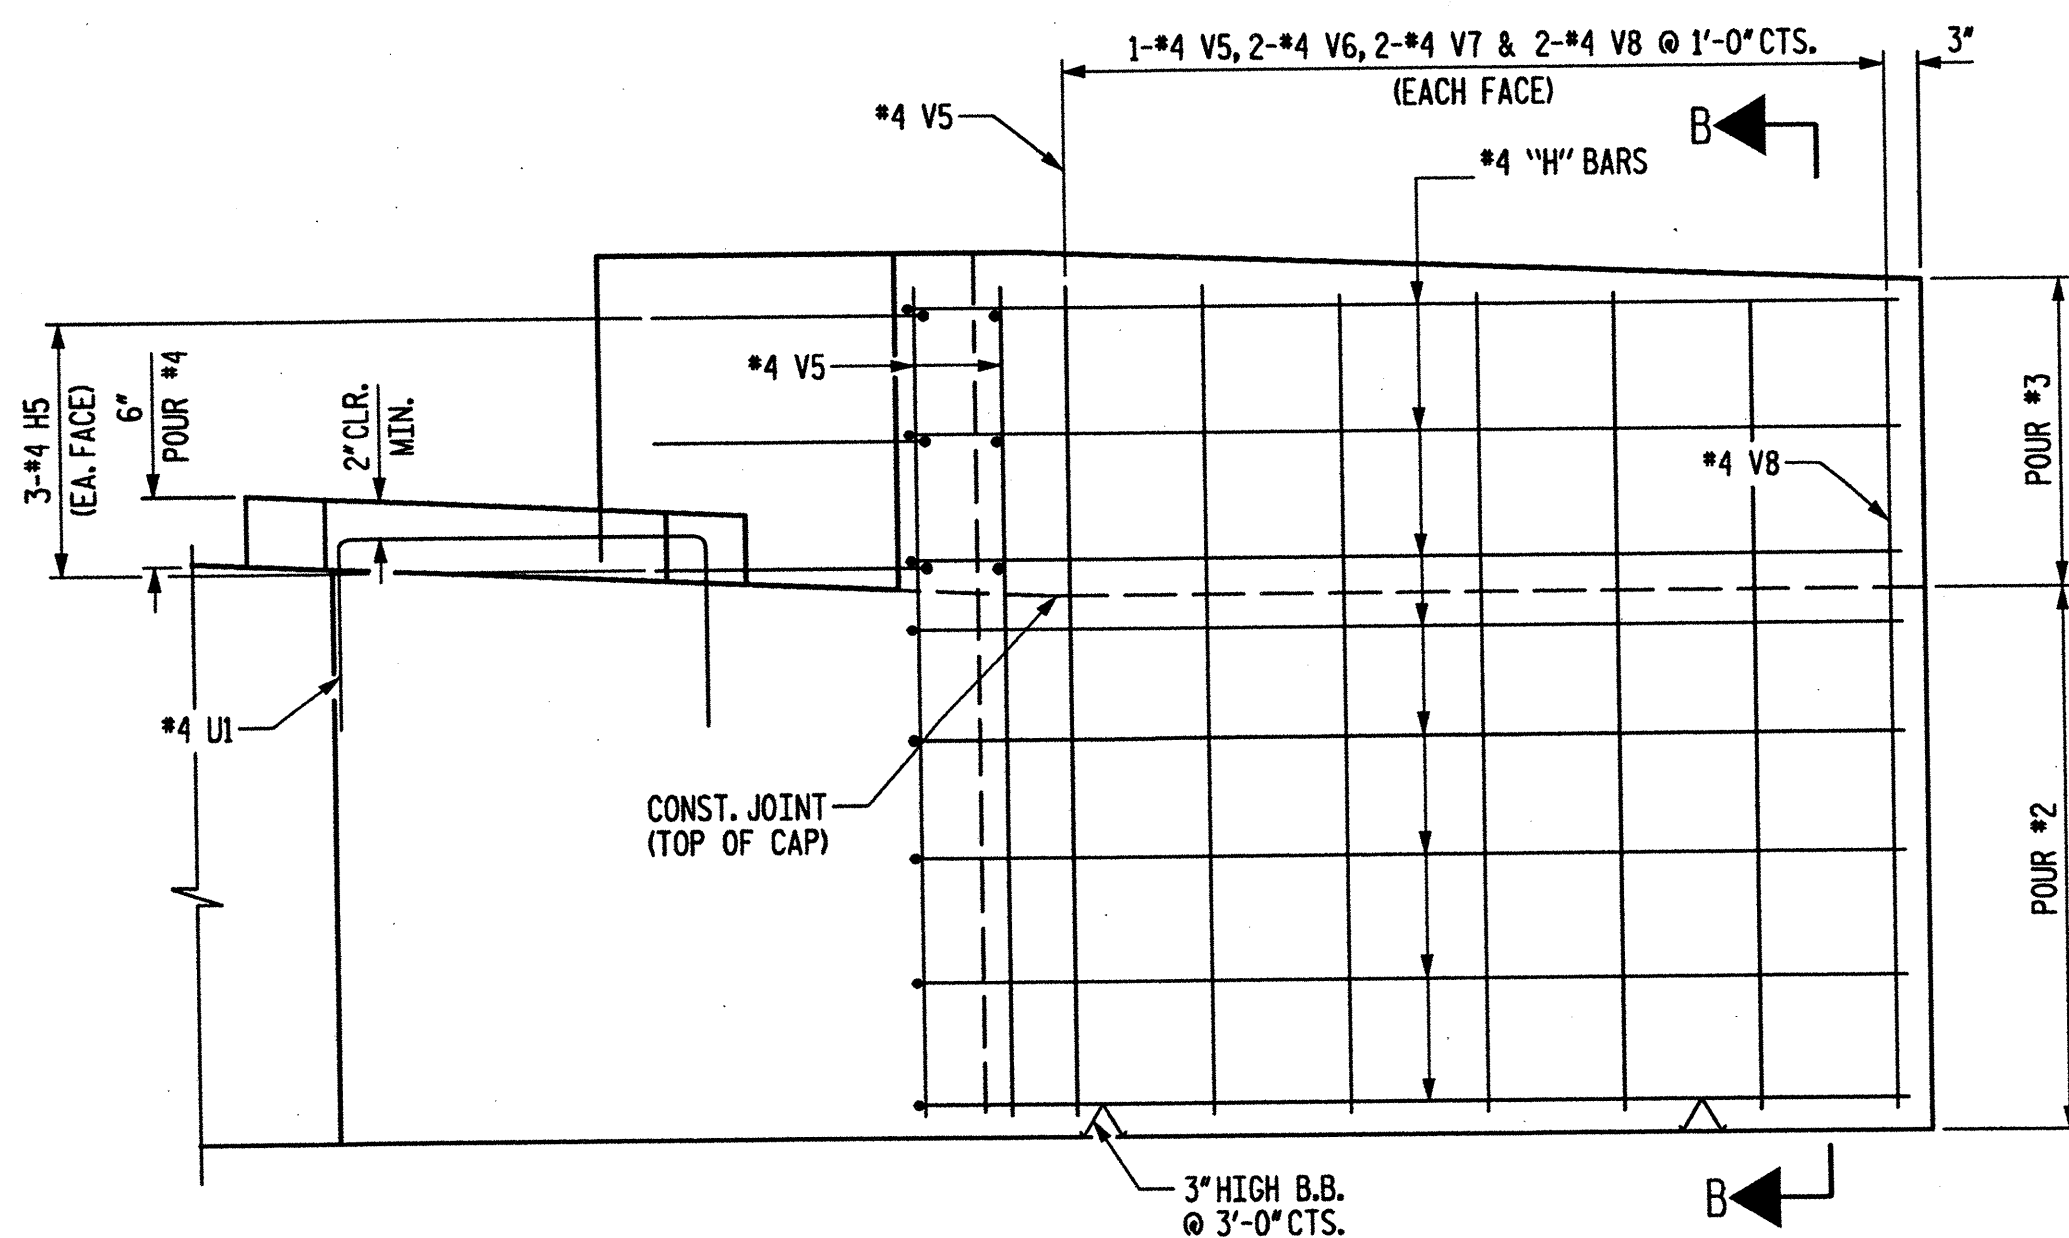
DETAIL OF RECESS IN TOP BACKWALL AT WING W2
